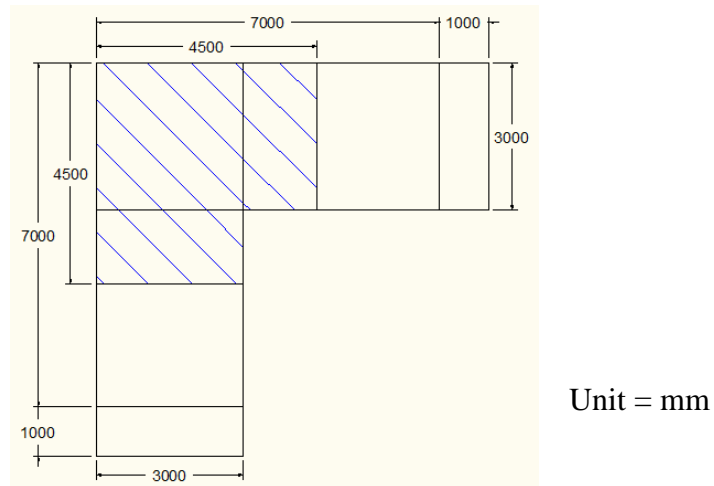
The Layout of 90° walkway with width of 3 meters
